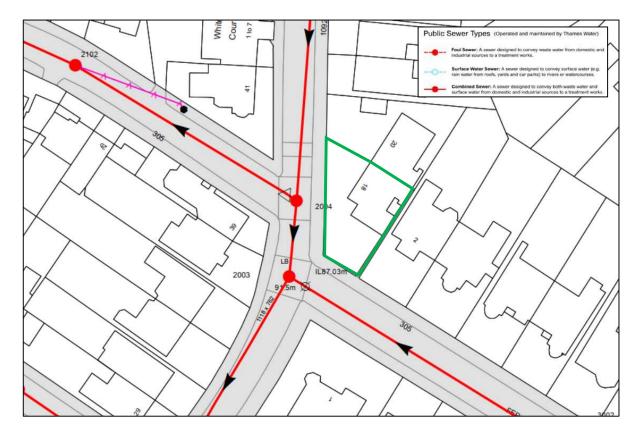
Thames Water Sewer Asset Plan (Site in Green)
